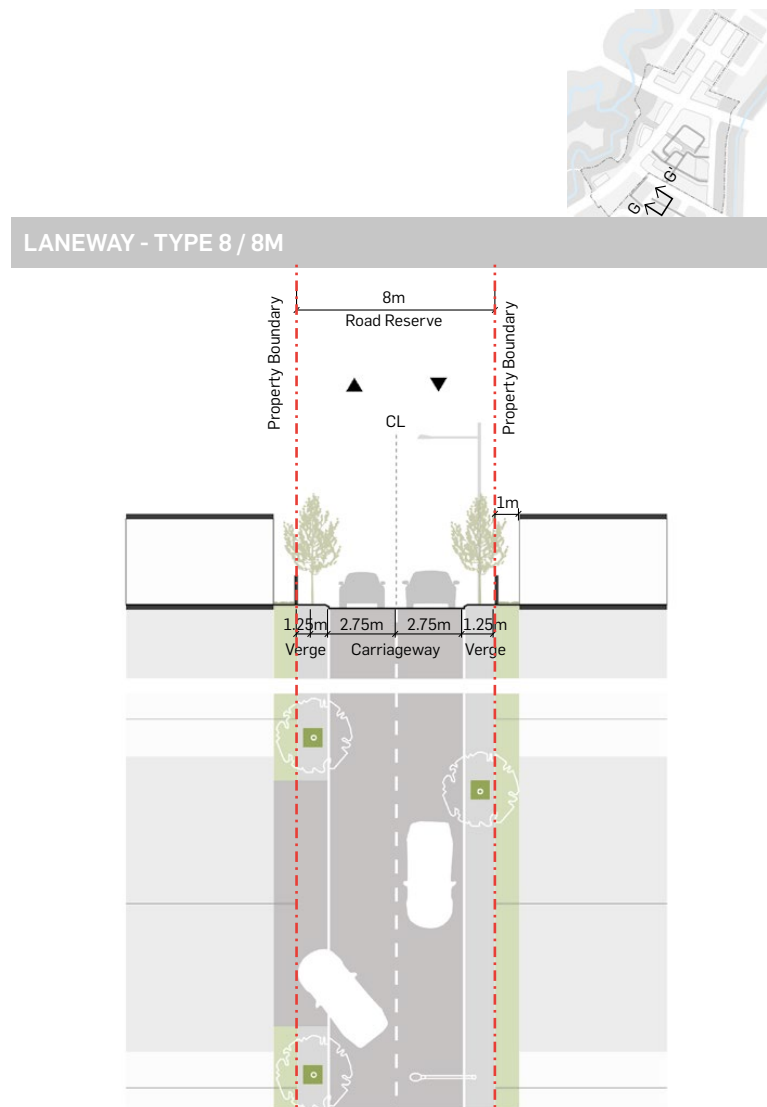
Indicative Street Section G-G' - Laneway - Type 8
